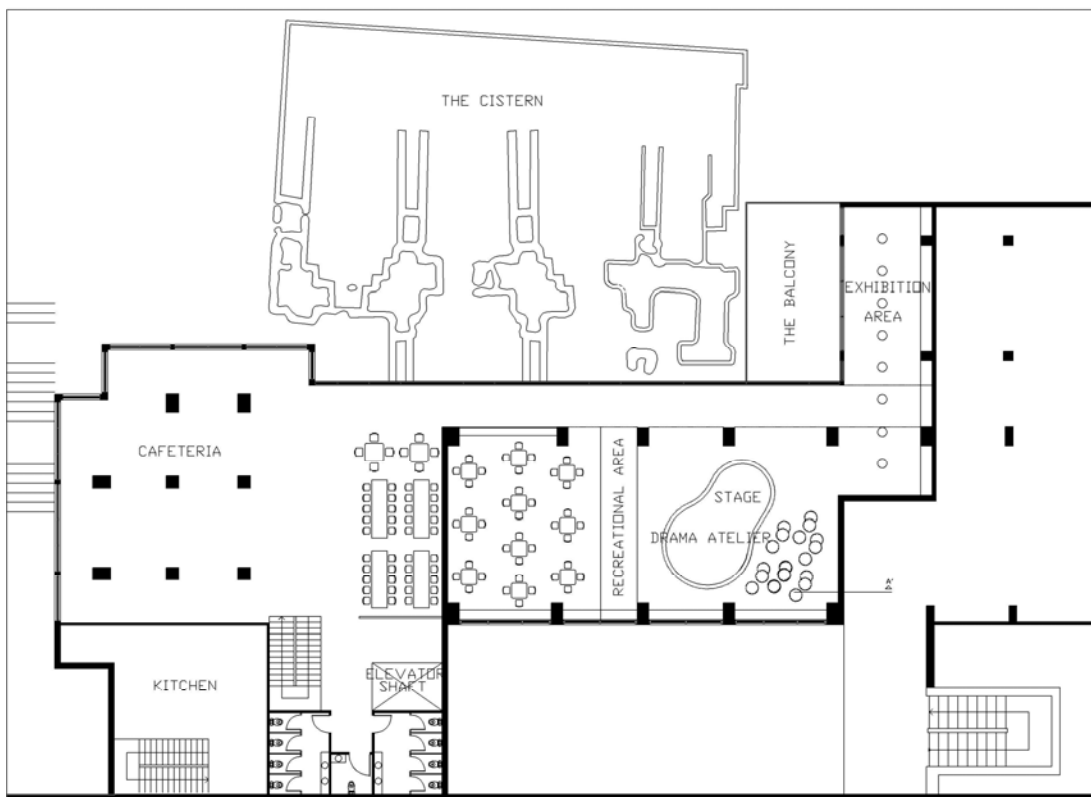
First floor plan with the areas under discussion (Drawing by M. Bige Varlier)
